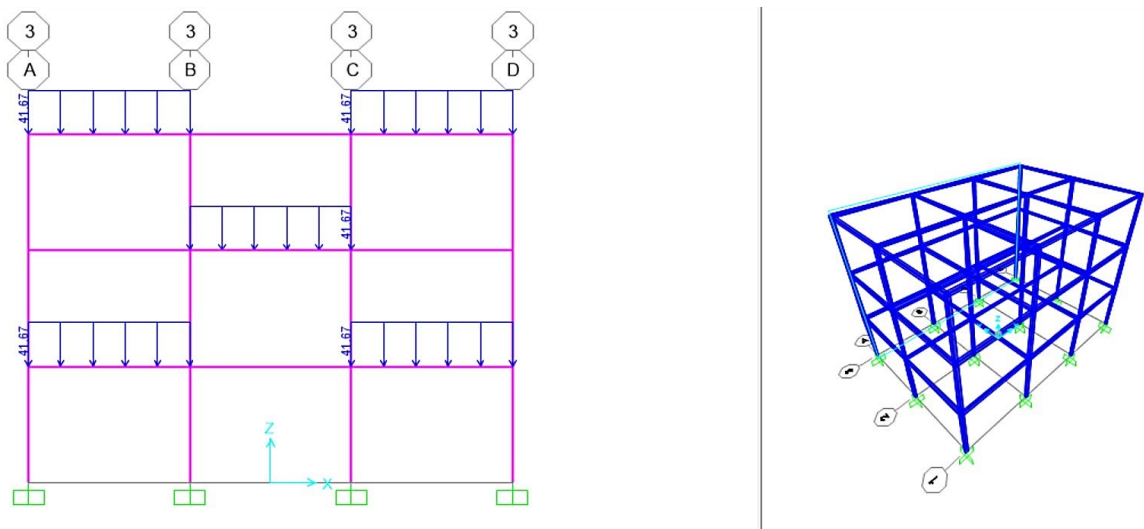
Building frame structural member sizes (HSS 8x8x1/4)
